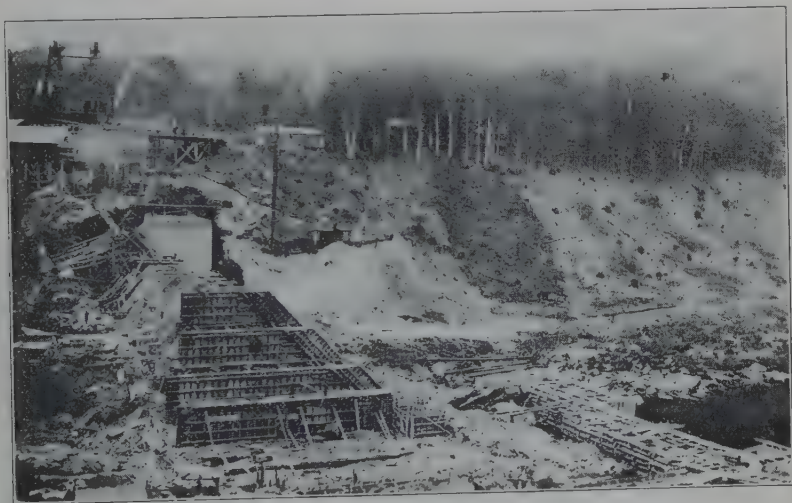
LOOKING NORTH, SHOWING EARLY STAGES OF CONSTRUCTION
